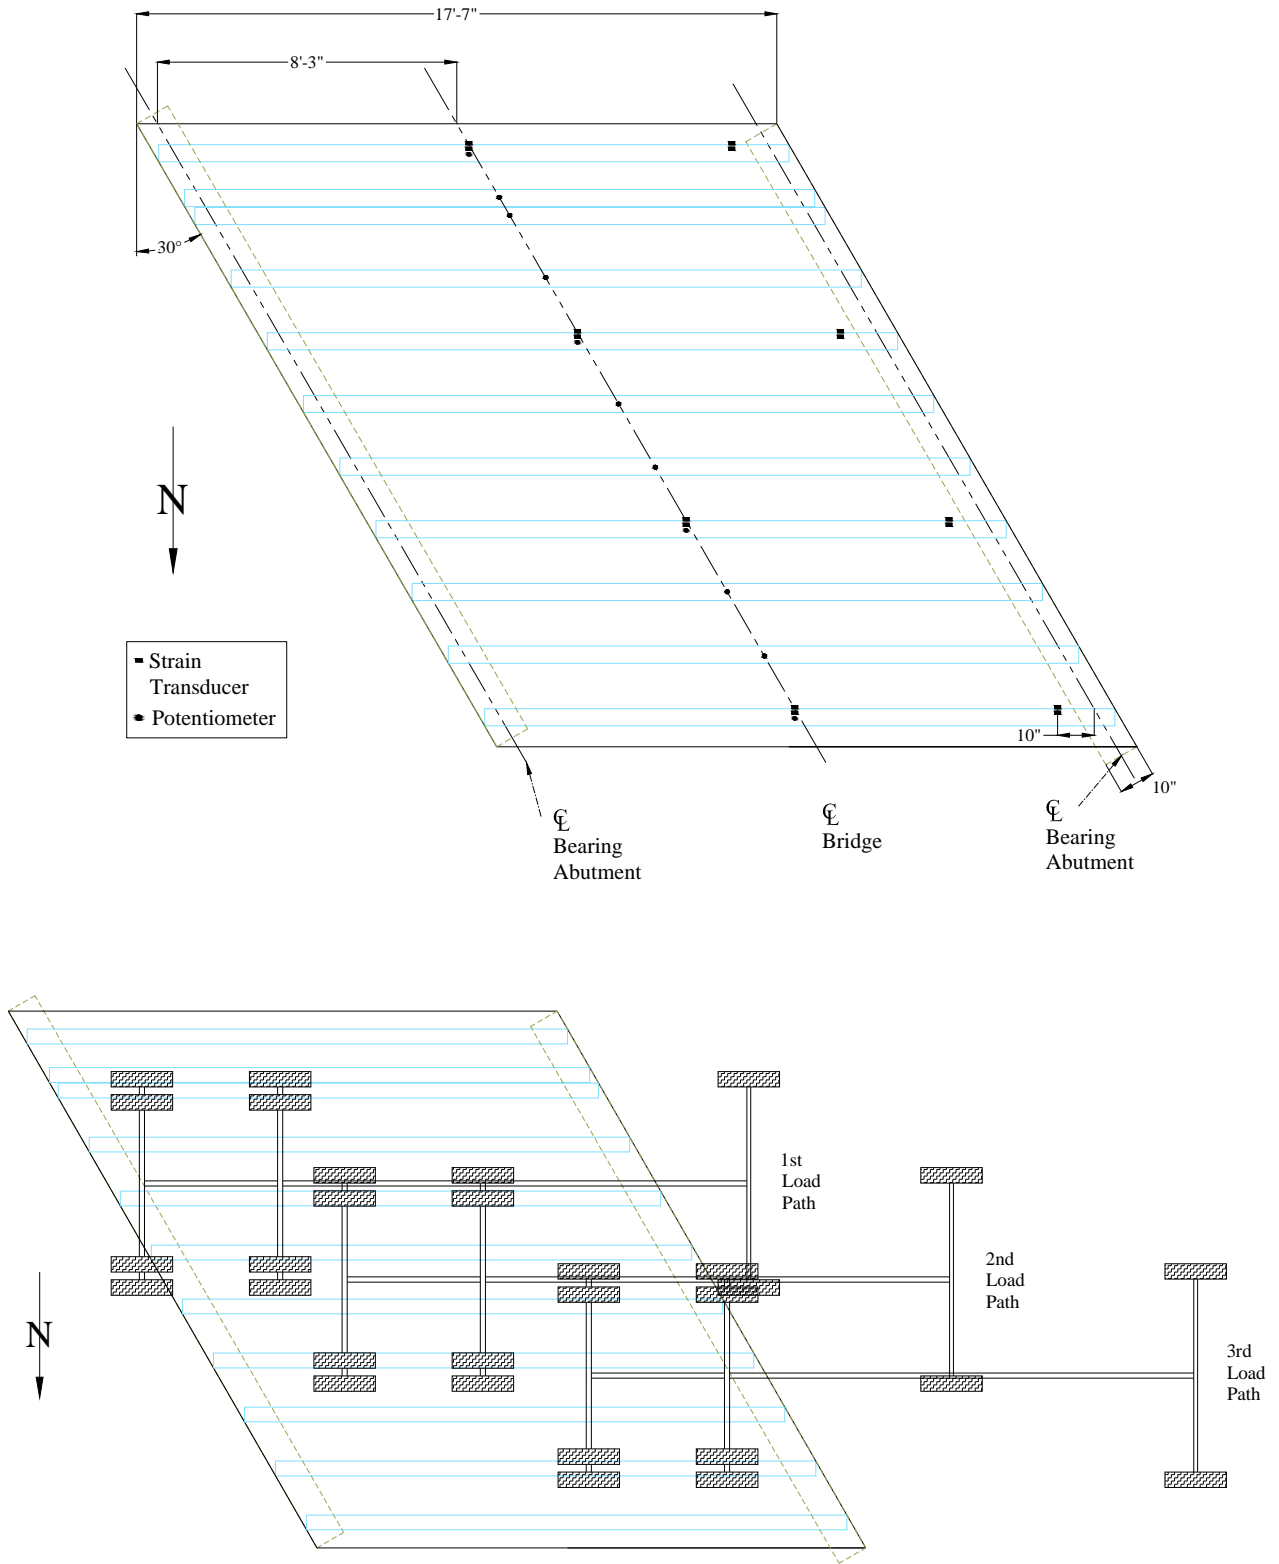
Instrumentation and Load Paths of Doebag Creek Bridge
